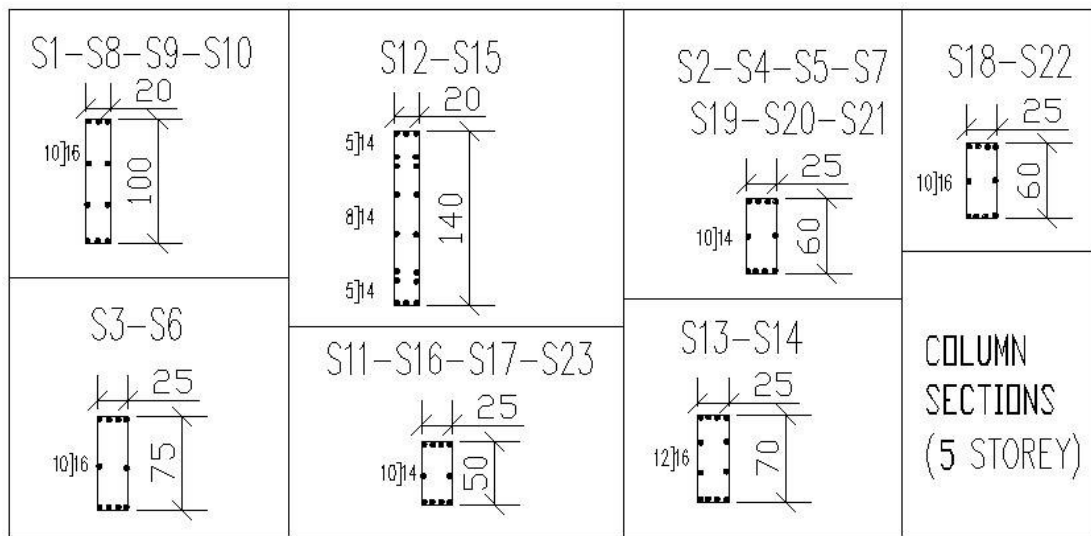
Column sections (column dimensions in cm; reinforcement in mm).
